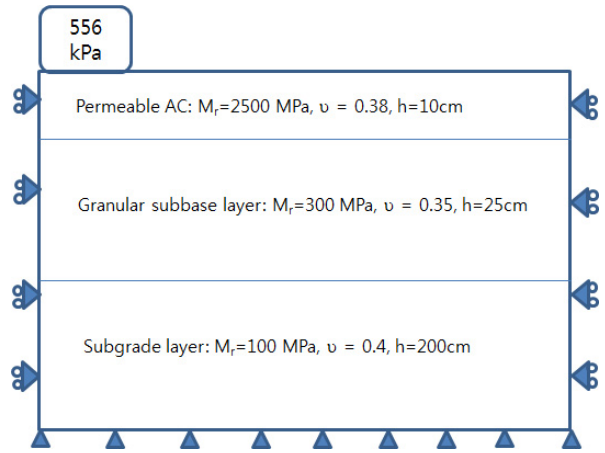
Permeable Asphalt Concrete Pavement Structure
